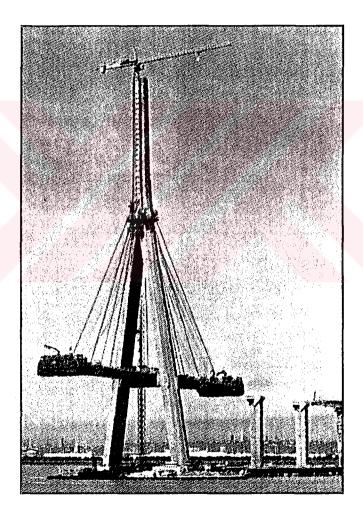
CONSTRUCTION OF THE DECK AT THE SOUTH PYLON (Courtesy of AFPC, 1994)
